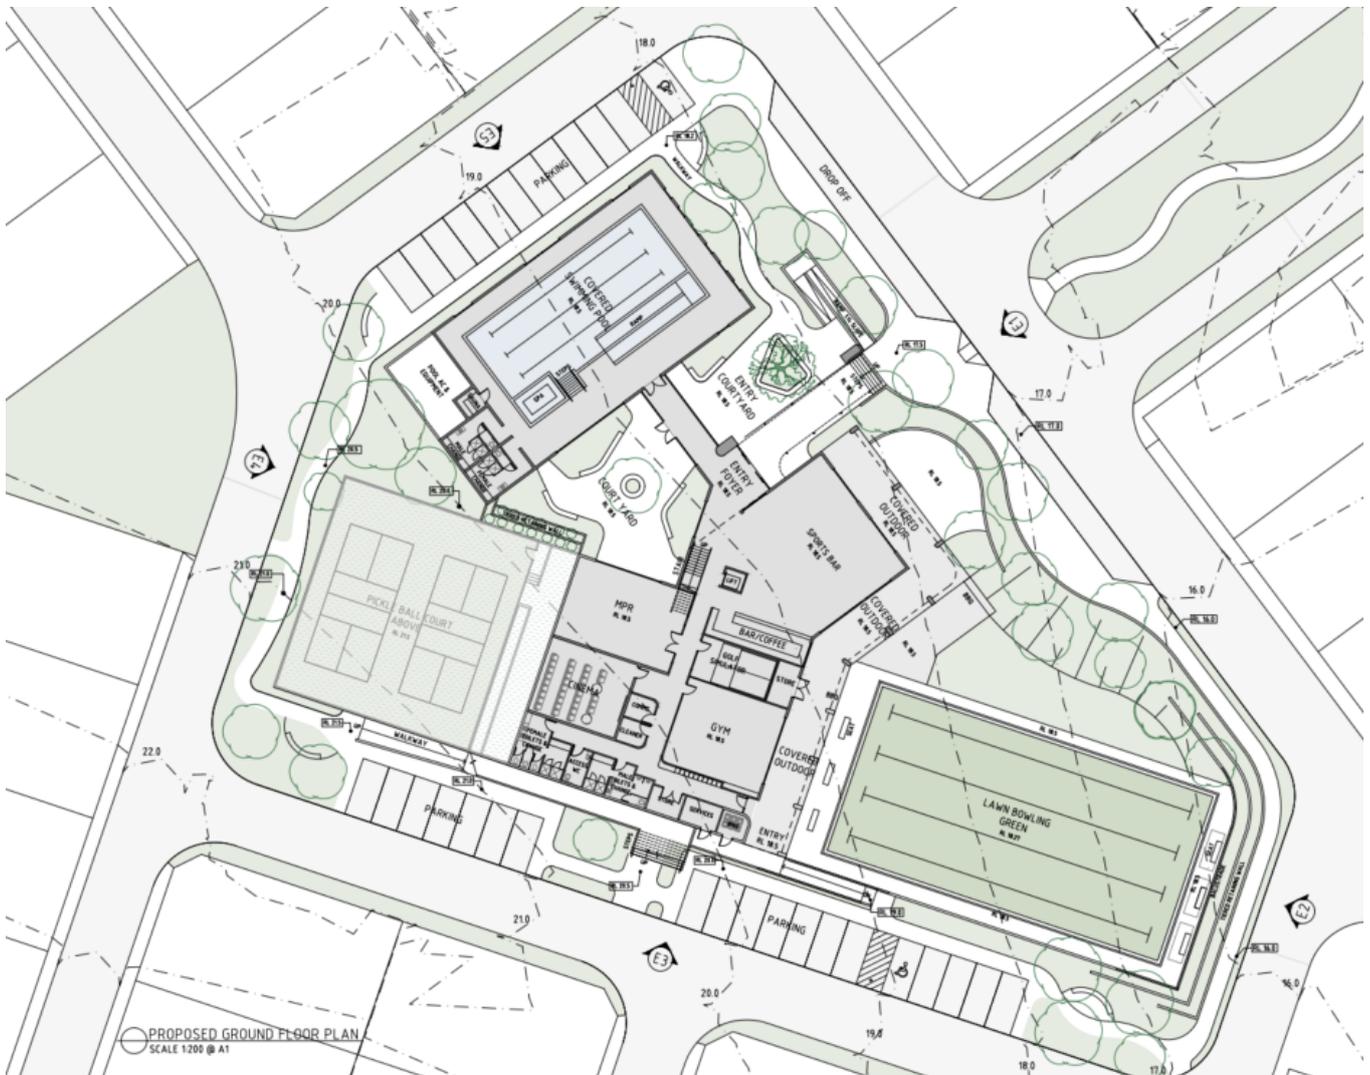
Proposed Clubhouse and Recreation Facilities site plan (Aube)
